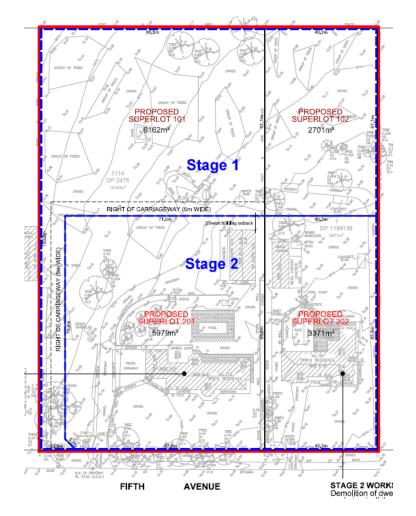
Proposed Stage 1 and Stage 2 Subdivision Layout (Subdivision Plan)
